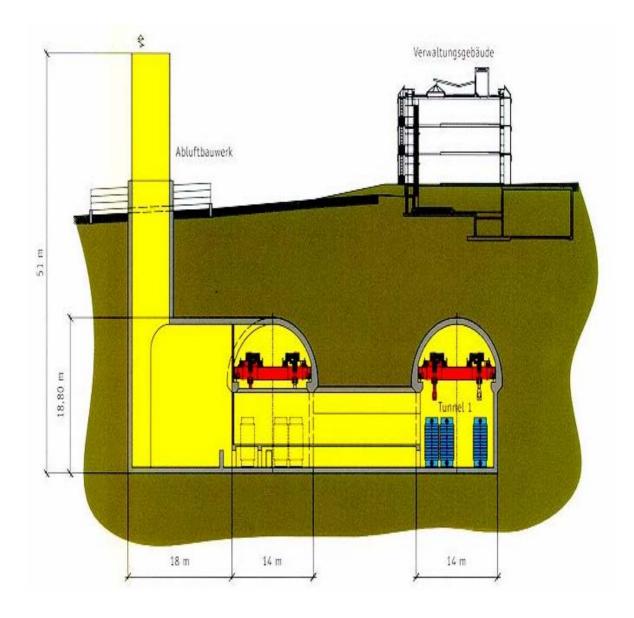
Cross section of Neckarwestheim interim storage facility (view from end of tunnel towards entrance hall)
